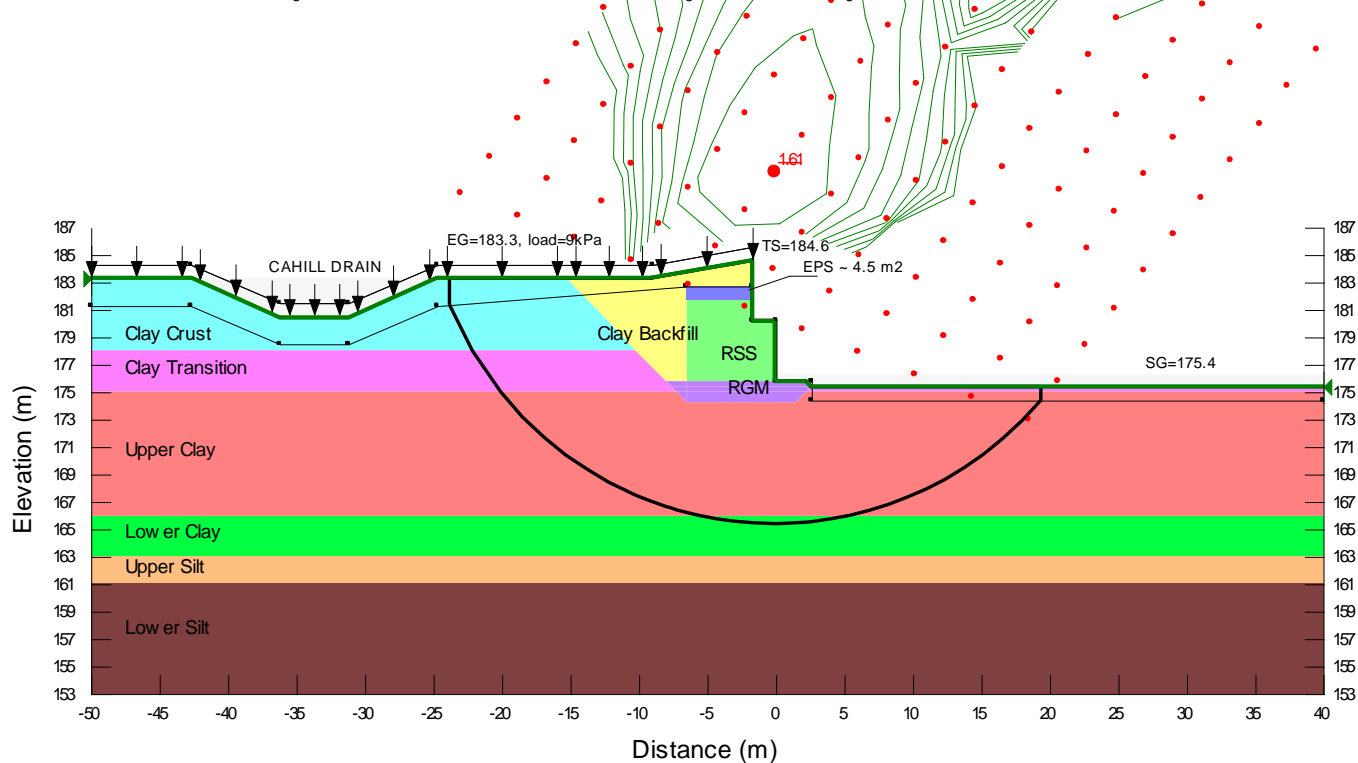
Global Stability Result – North Abutment (West Segment)– End of Construction (Undrained) Loading
